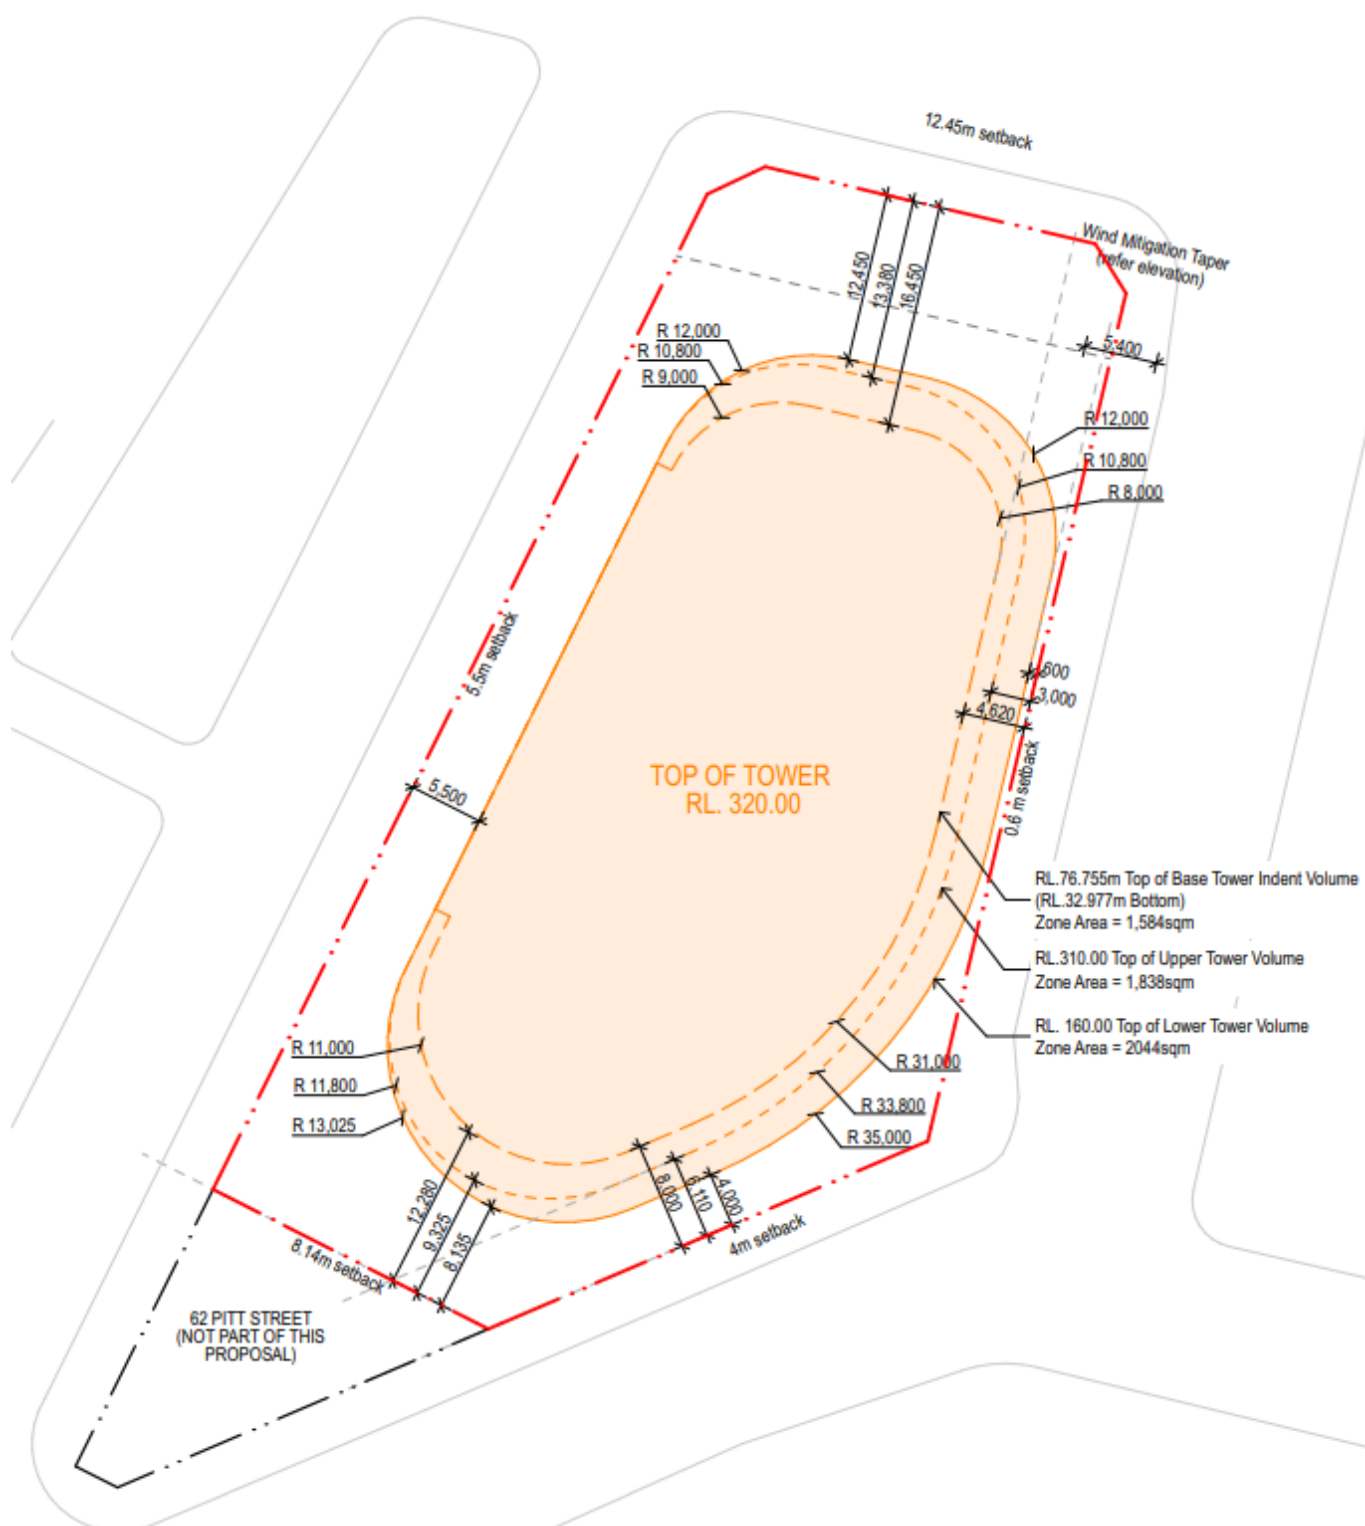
XX Pitt and Bridge Street, Sydney – planning envelope – tower setbacks
